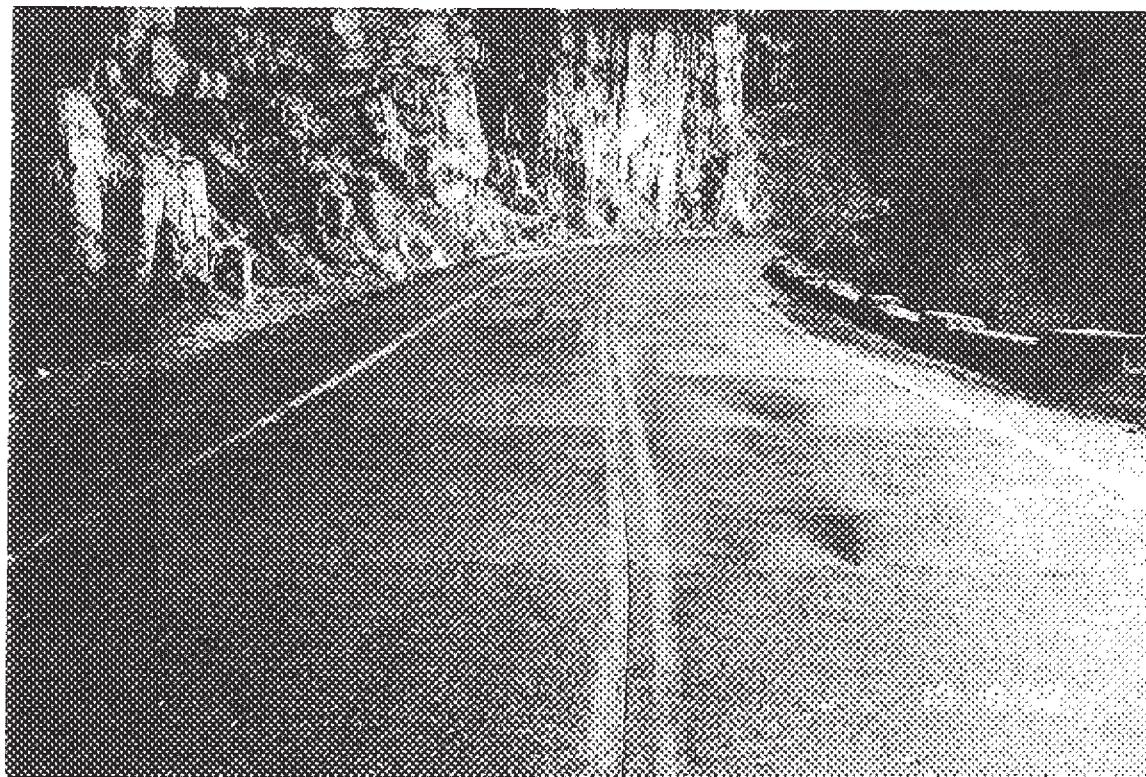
MP 7.00 - Concrete point outside tunnel
